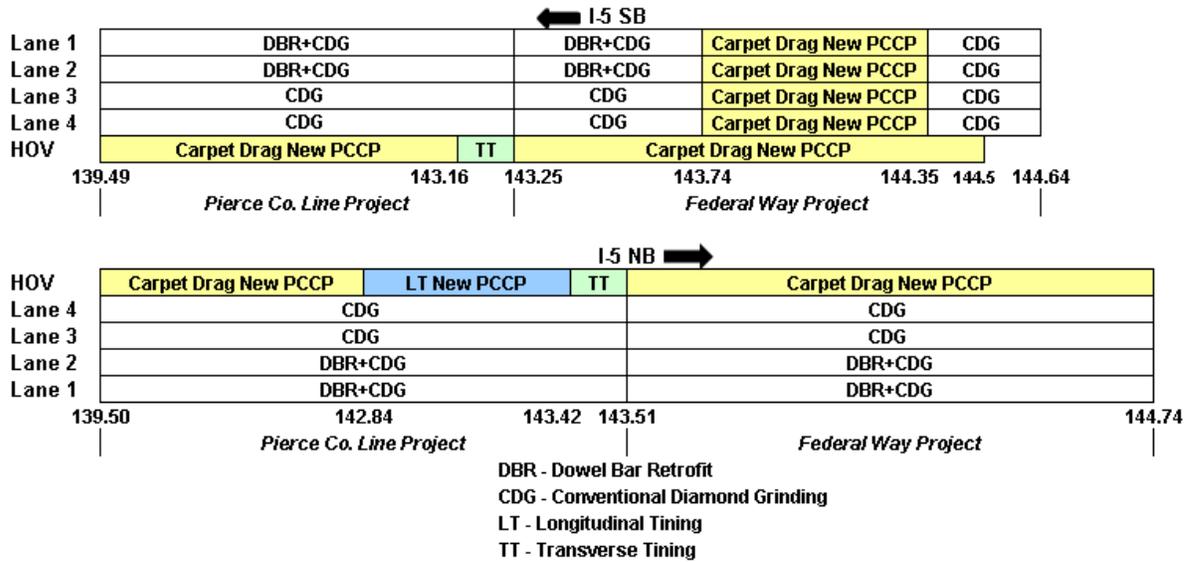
I-5 Federal Way projects with carpet drag, longitudinal and transverse tined texture.
